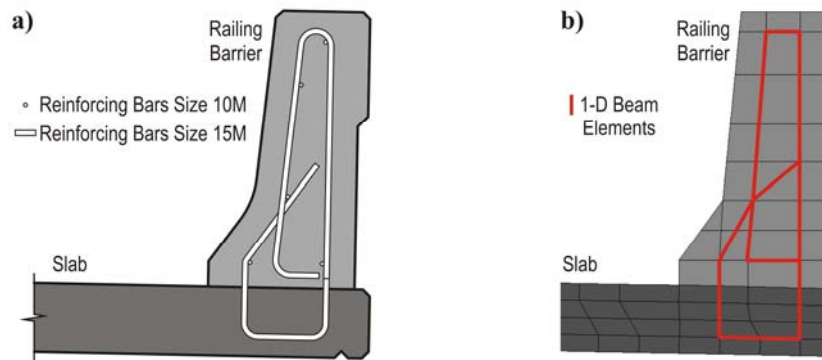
Cross-section of the traffic railing barrier: a) actual object, b) FE model
